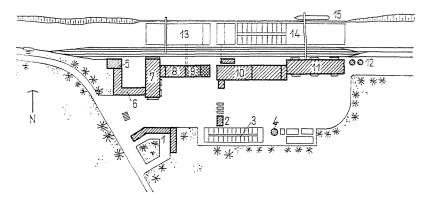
Lay-out of a sugar-factory: 1 - entrance - garage - service building; 2 - delivery building; 3 - sugar-beet storehouse; 4 - cooling tower; 5 - engine-house; 6 - workshop; 7 - beetroot slice storehouse; 8 - drying room; 9 - power station; 10 - preparatory workshop; 11 - sugar storehouse; 12 - molasses storehouse; 13 - cinders deposit; 14 - beet storage; 15 - river
